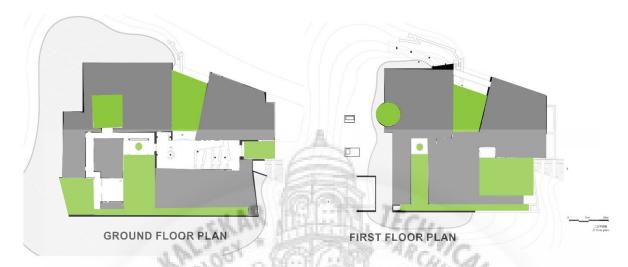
build -unbuild ratio of space in ground floor and in upper floor
